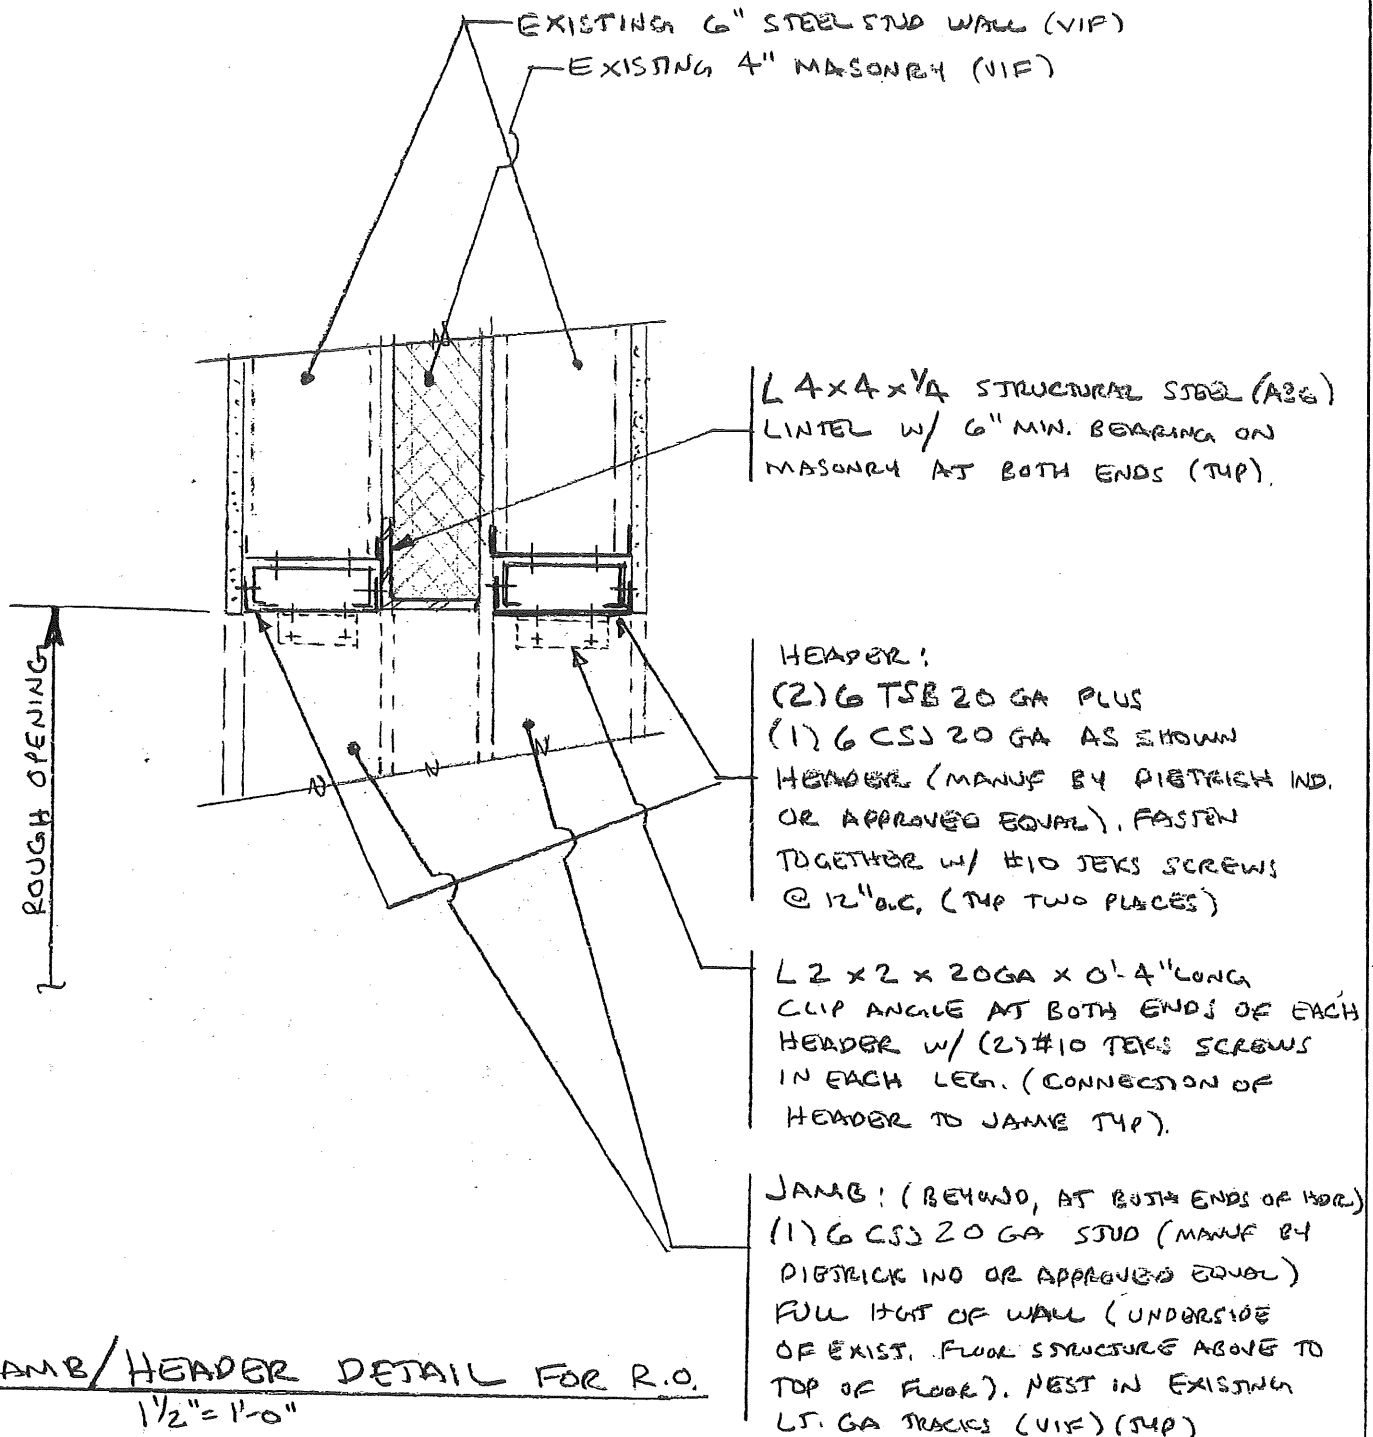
DETAIL OF OP'NG BETWEEN UNITS 12 & 14 - AND 14 & 16.
